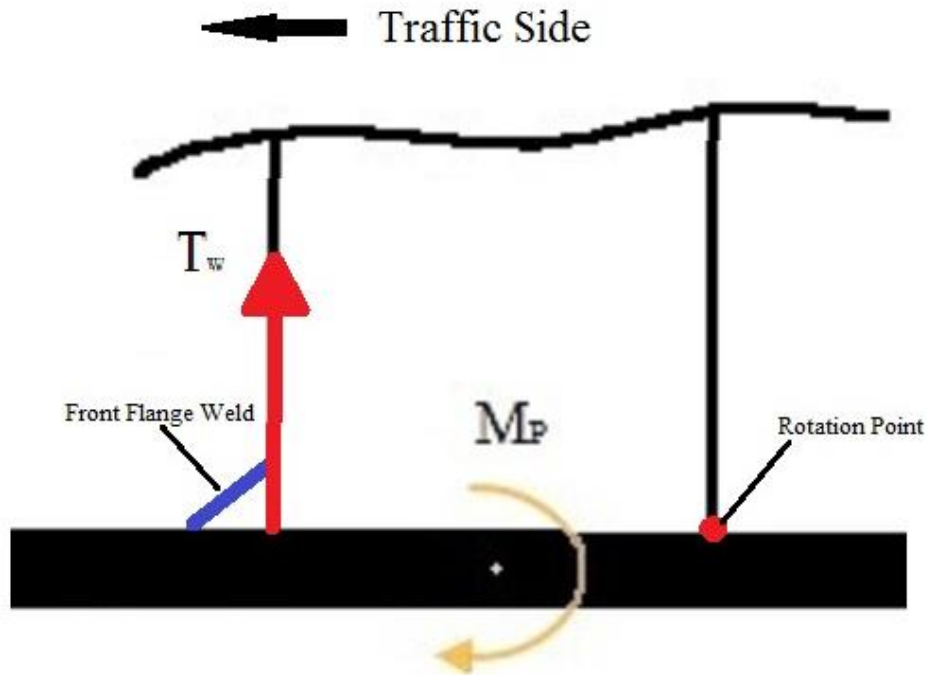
Post-Baseplate Front-Flange Weld Tension Diagram
